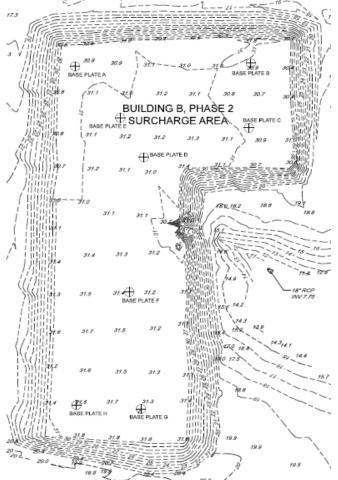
Plan view of surveyed surcharge sitting over a building footprint
